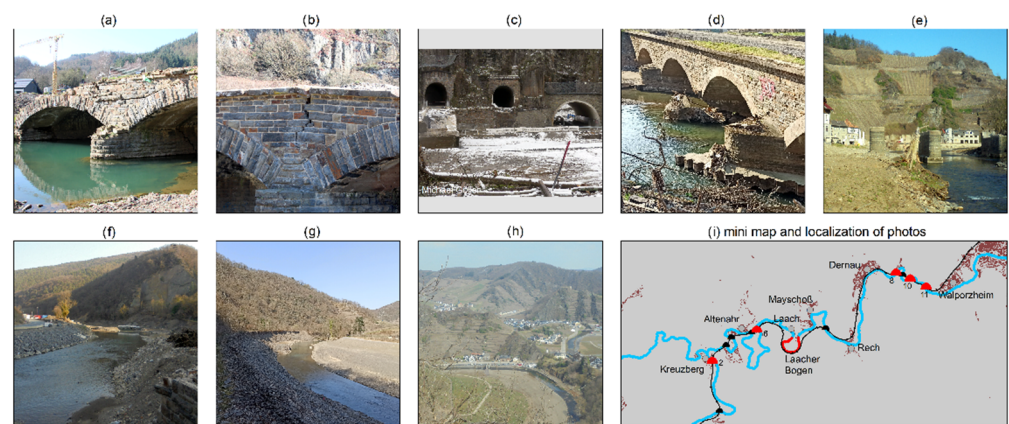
Examples of observed damages and fluvial morphological changes along the railroad line. (a) Damages on bridge 2 through backwater effects. (b) A crack in the foundation of bridge 2. (c) Remains of the two-lane bridge 5. The cycling path went into the tunnel on the left, the railroad line into the tunnel in the middle. The tunnel on the right is the lower lying road tunnel, through which flowed parts of the discharge. (d) Damaged pier at bridge 8. The damaged pier was located on the river bank before the event; the course of the Ahr River ran only through the two front arches. (e) Remains of bridge 10 with a missing pier in the middle of the riverbed. (f) Location of the removed bridge 11 at the narrowest point of the Ahr valley. The road’s retaining wall (left) was eroded by the flood event. (g) The cut bank of the meander “Laacher Bogen” with strong lateral erosion, undercutting the railroad embankment. The route of the railroad line is indicated by the masts. (h) The meander neck at Laach, where parts of the flood wave shortened the meander bench, following the road (ancient railroad track). (i) Mini map providing an overview of the localization of the photos.
